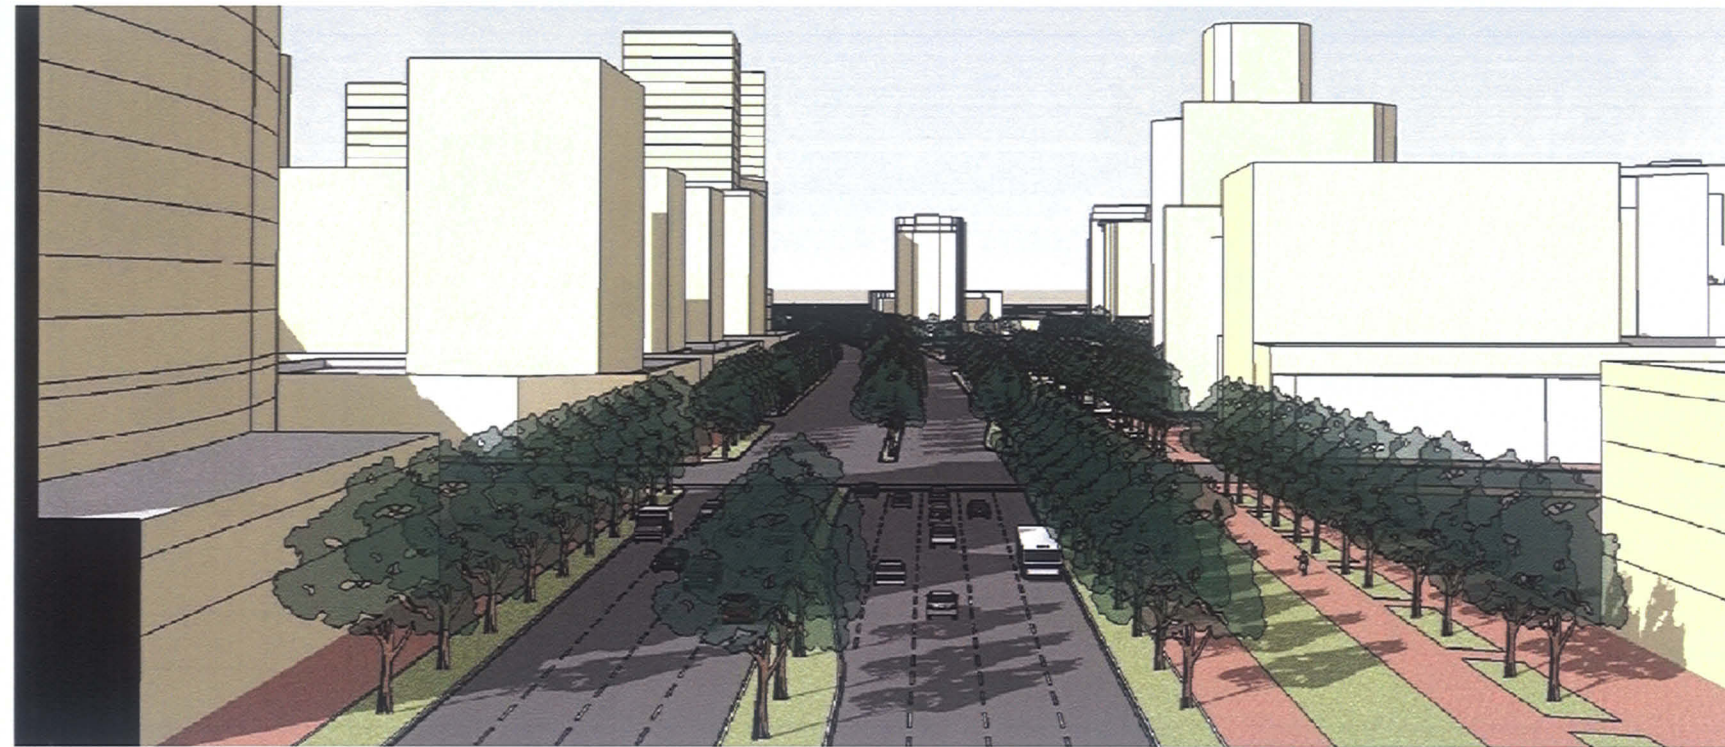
Rockville Pike Boulevard and Promenade Cross Section
